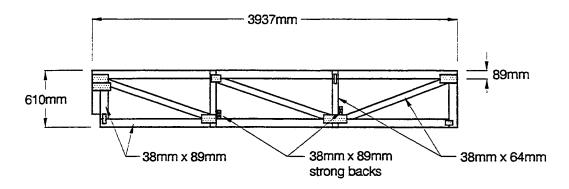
Construction of 610 mm deep wood trusses using 38 x 89 mm lumber.
